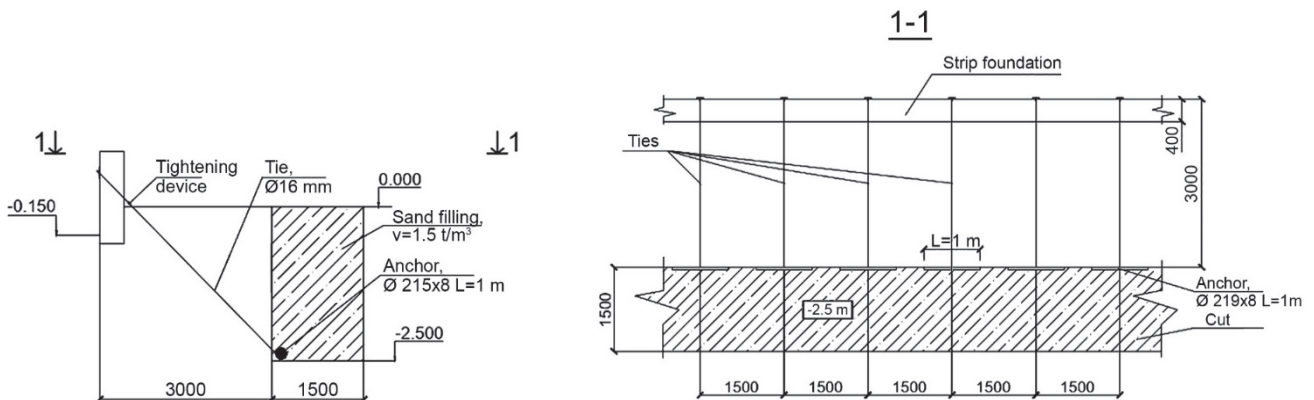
Method 2. Installation of tie-beams in the strip foundation of an arched building with steel pile anchors
